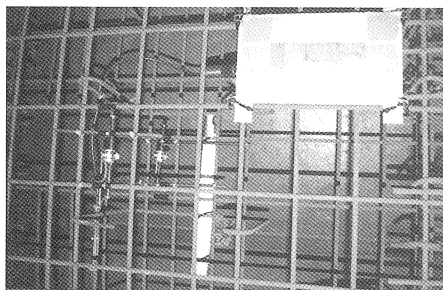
Top view of strain gages and pressure cell mounted on reinforcement, just before casting the concrete of a segment.
